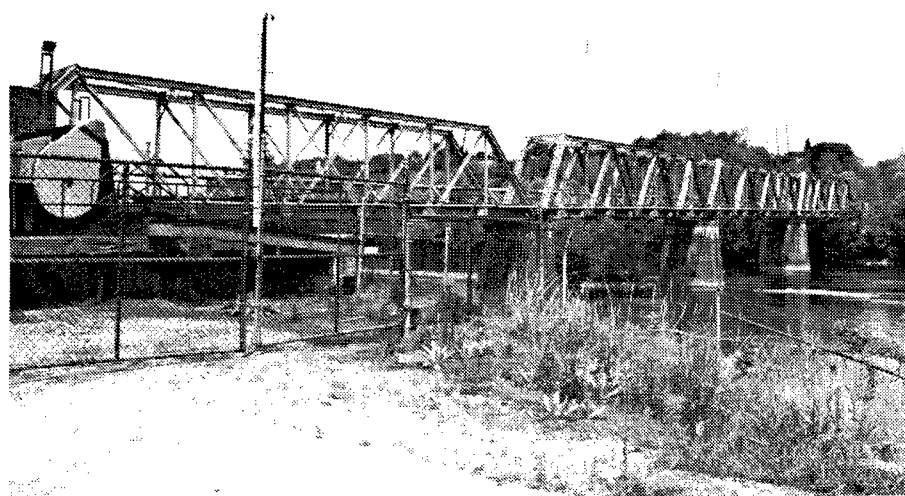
Railroad bridge, located behind Building 201, shown crossing the Holston River.
